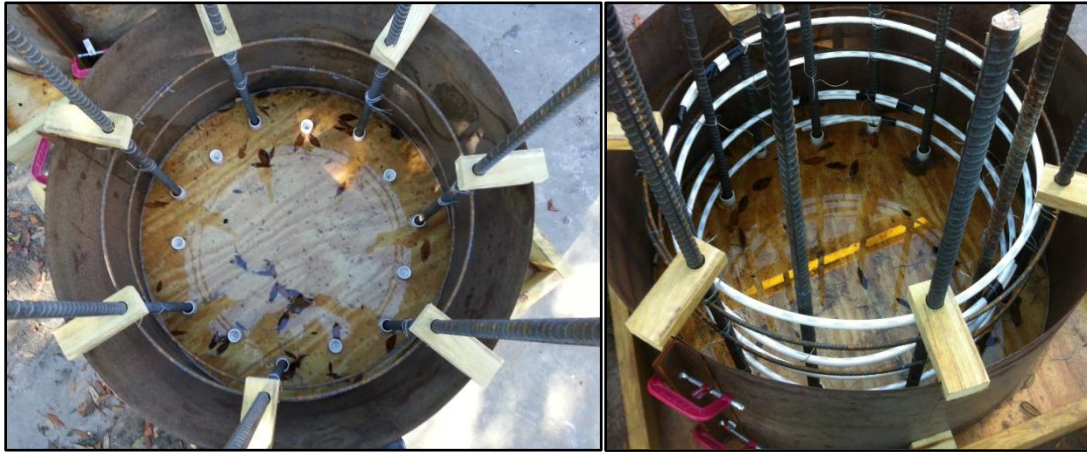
Structural, outer layer, reinforcement (left) and full cage (right).
